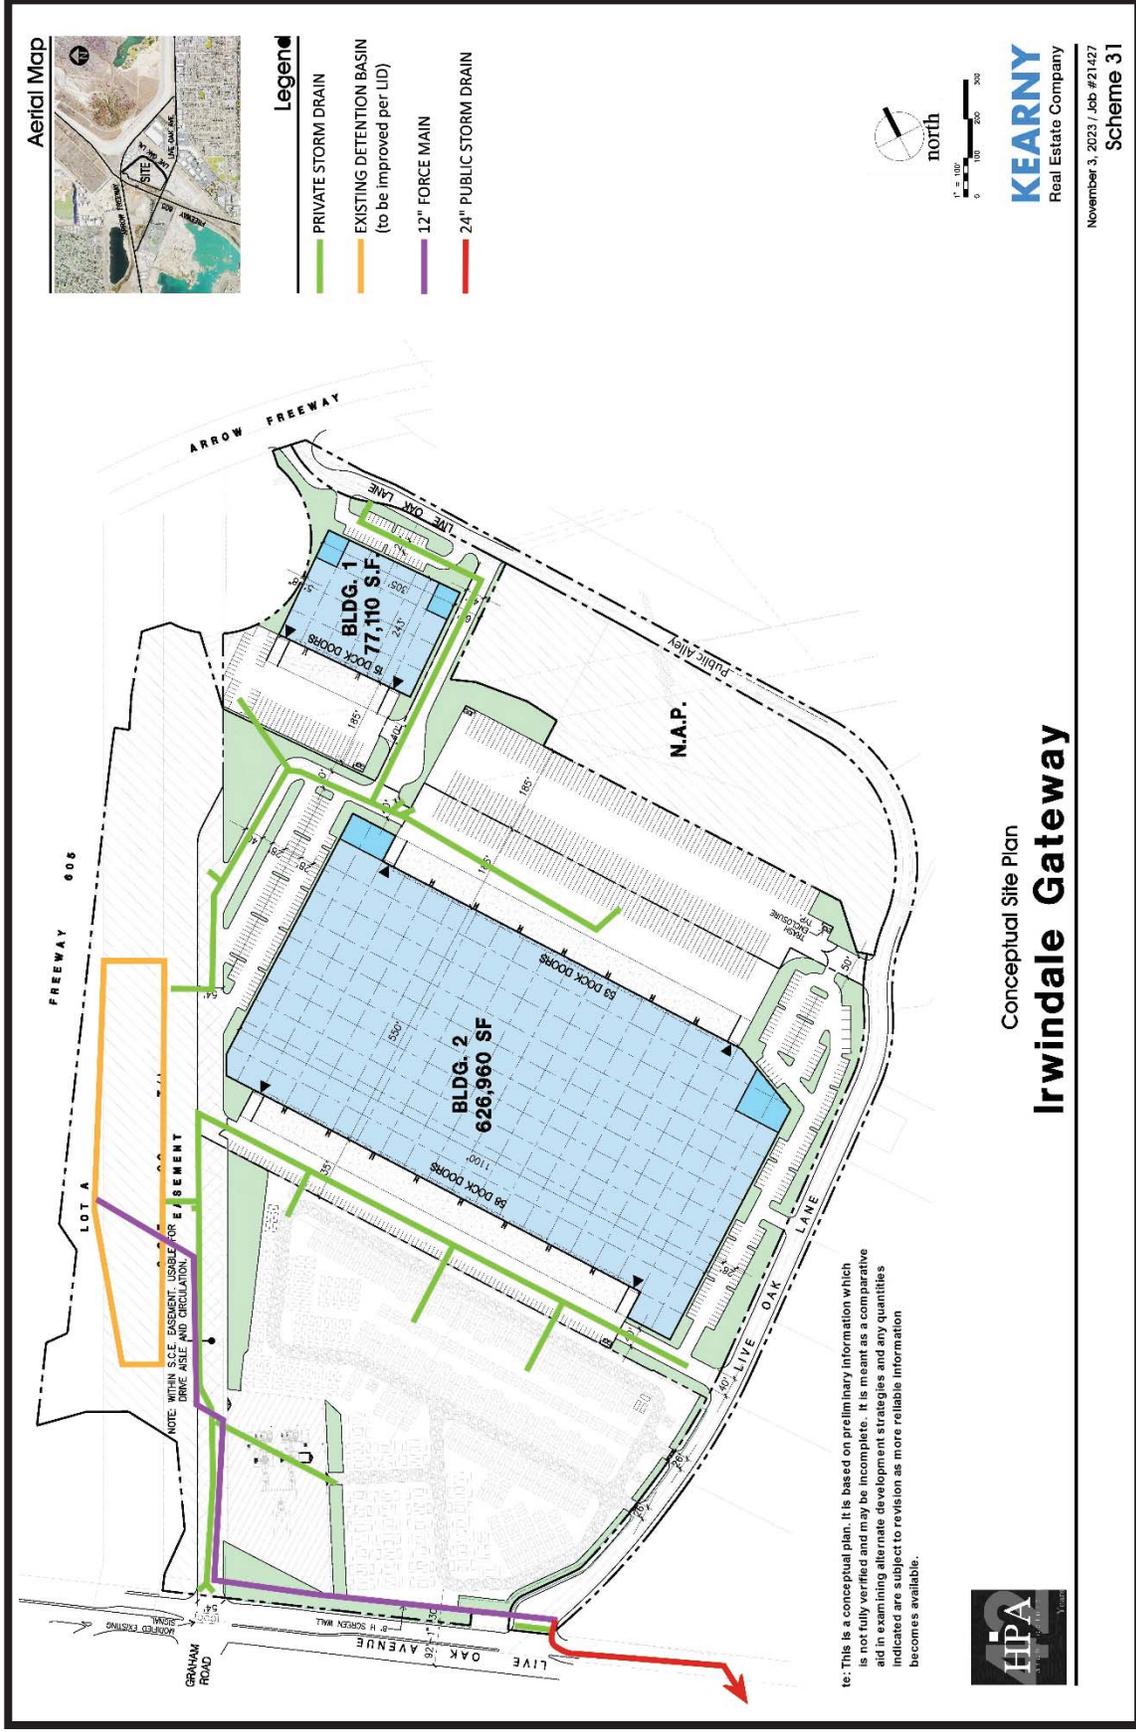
CONCEPTUAL STORM WATER MANGEMENT PLAN WITH BESS
